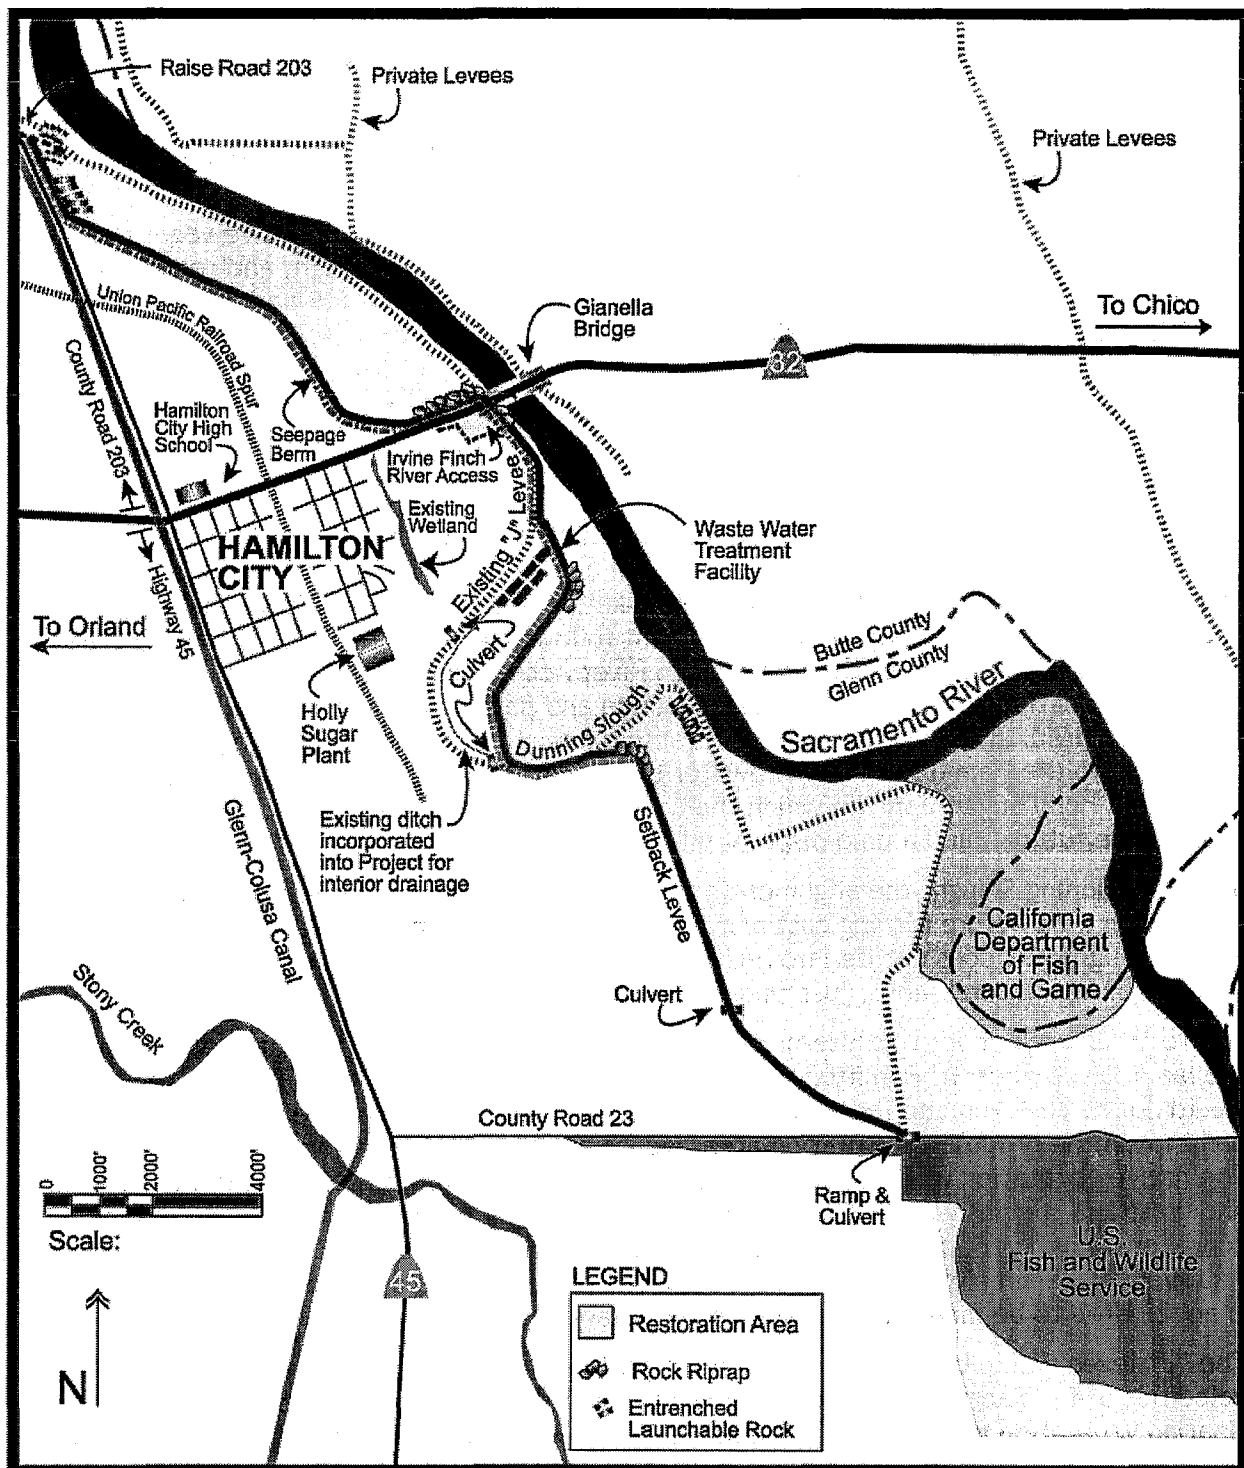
Ecosystem Alternative 6 - Intermediate Setback Upstream of Highway 32, Locally Developed Setback Downstream of Highway 32
